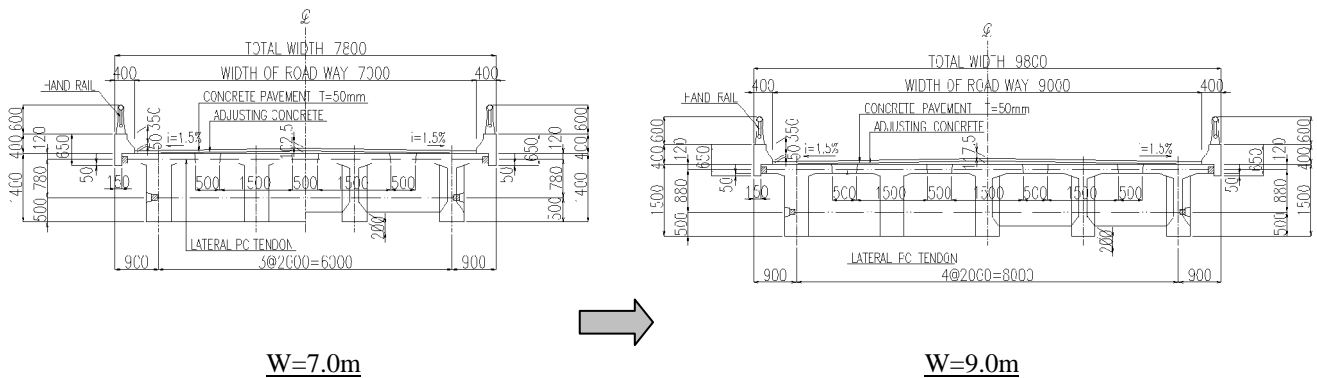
Widening of Bridge Formation Width (Da Dung Bridge)
